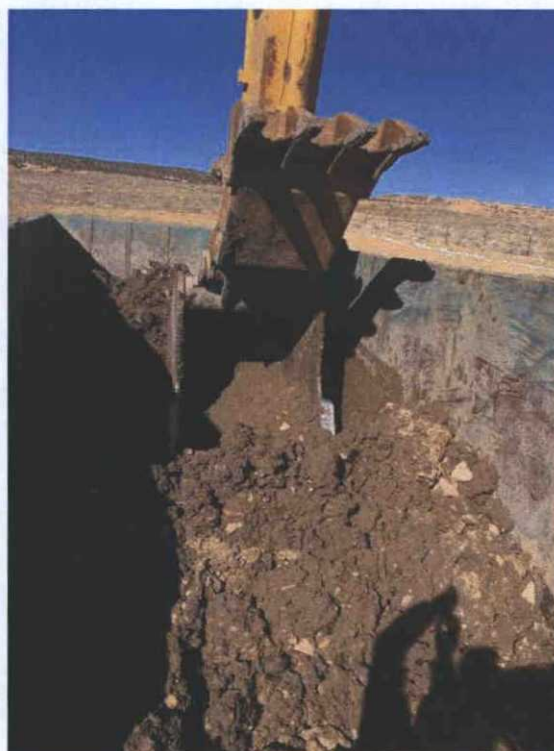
Mixing the drill cuttings with clean soil from trench excavation. Stabilization was achieved at a ratio of 1 (clean): 1 (cuttings).
